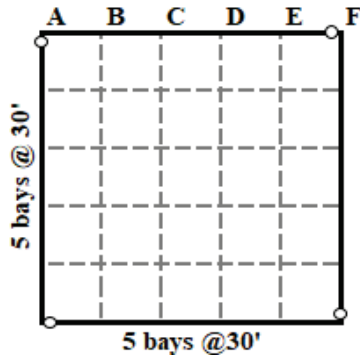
Baseline SDC D_{max} steel moment frame building typical 9-story plan.
